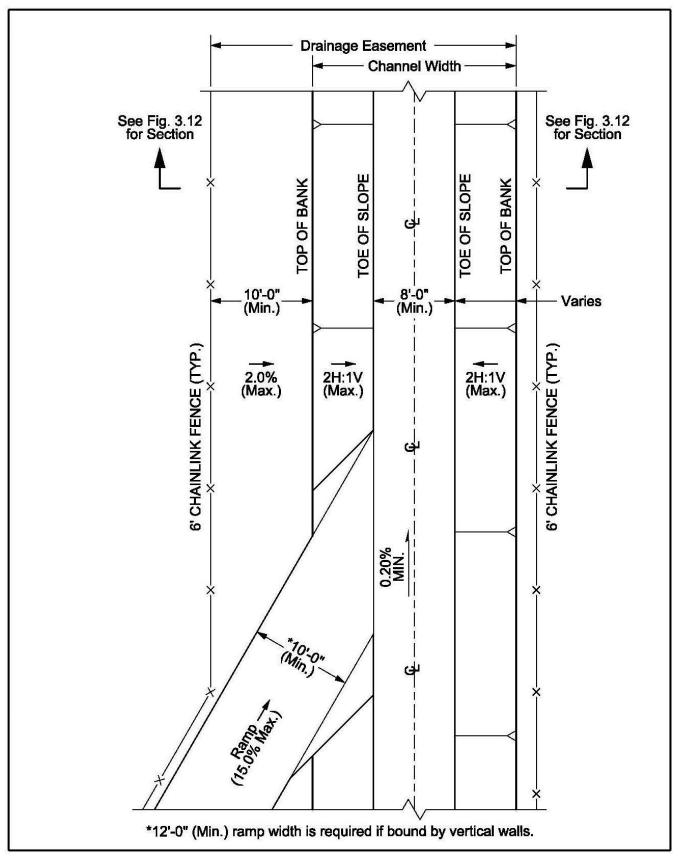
Plan View - Trapezoidal Concrete Lined Channel
